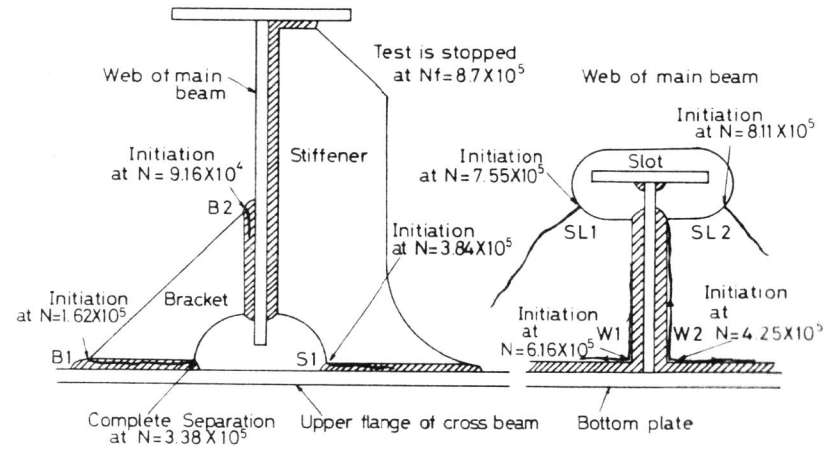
Behaviour of Fatigue Cracks in the Intersecting Part of Main Beam/Cross Beam for Type 1 Beam (Load = 0.37 MN)
